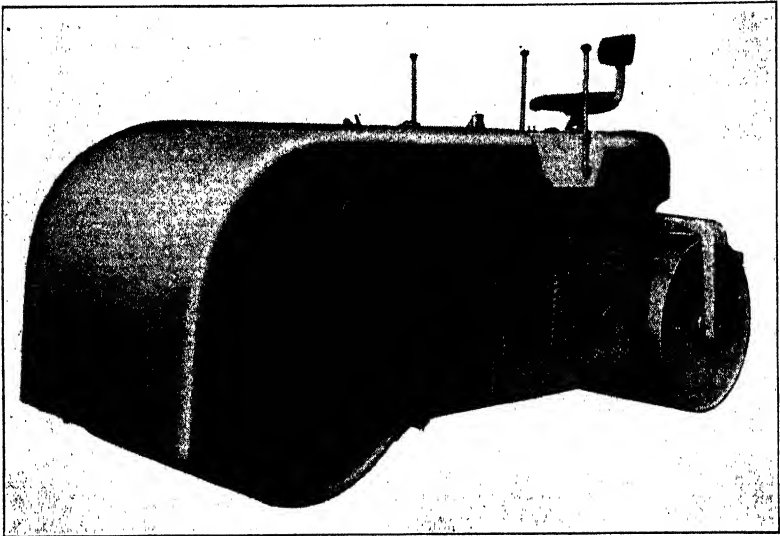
Five- to eight-ton tandem roller. *Courtesy of Huber Manufacturing Company.
